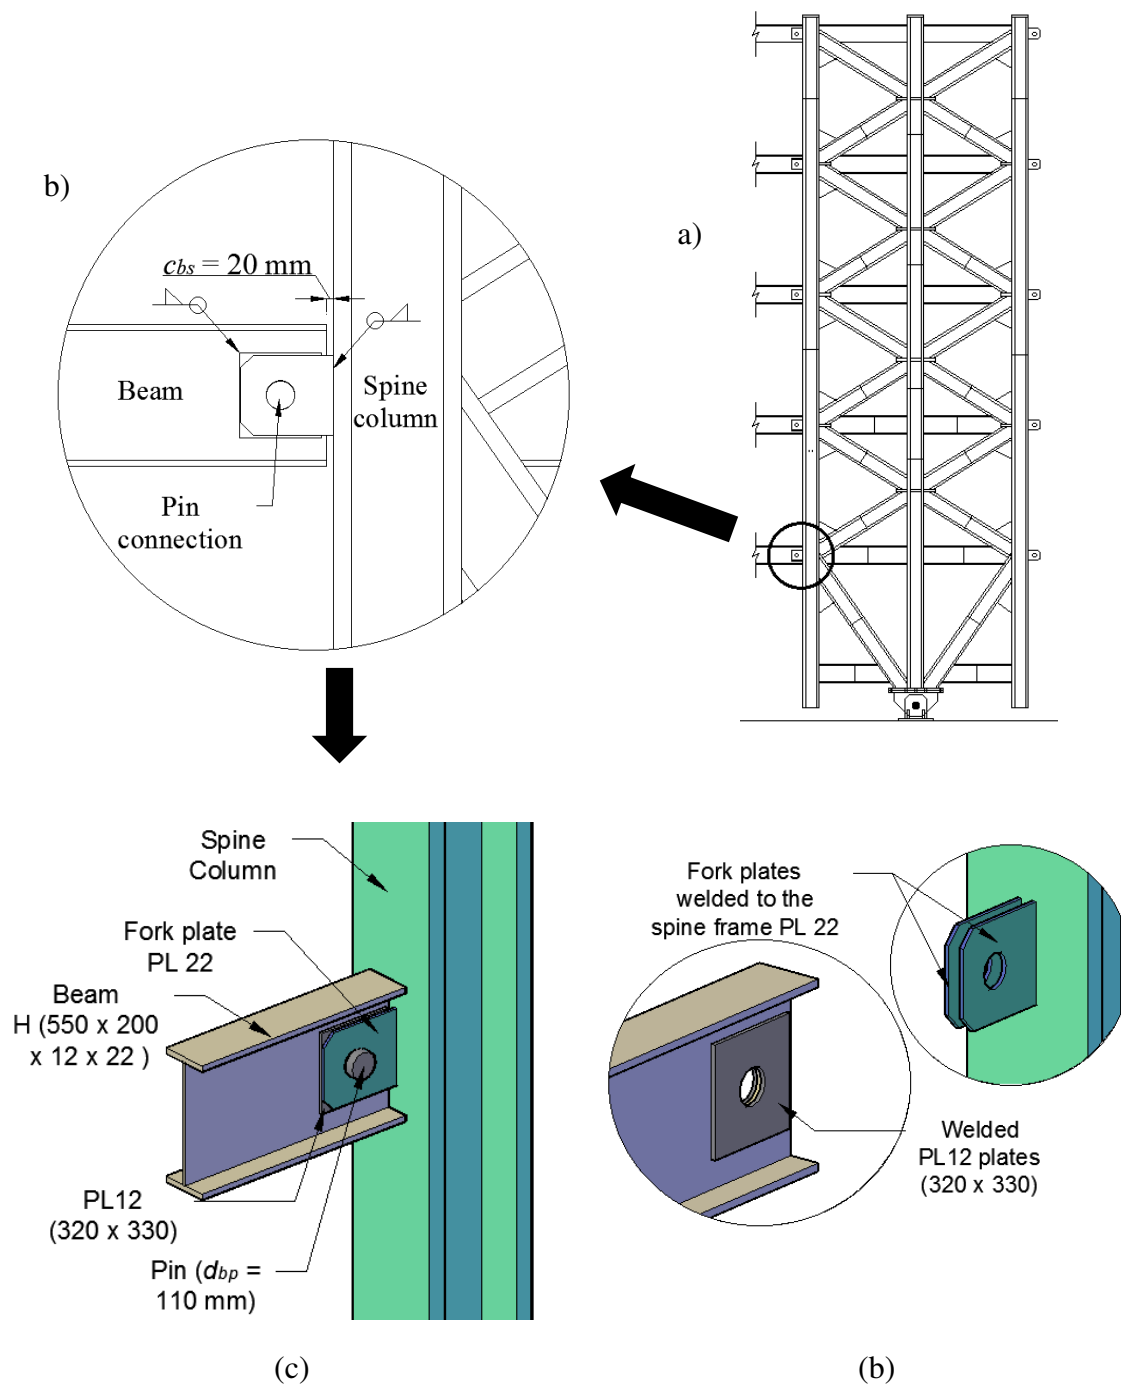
Pin connection of the beam: c) 3D view of connection, (d) Reinforcement plates welded to the H beam (left) and pin fork plates welded to the spine column (right)
